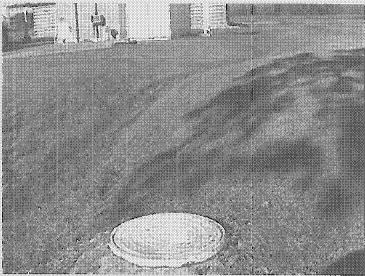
Proposed Site, NASA Consolidated Battery Test Facility, Johnson Space Center, Houston Texas. Viewed from the Southern Boundary of the site, facing northwest.
